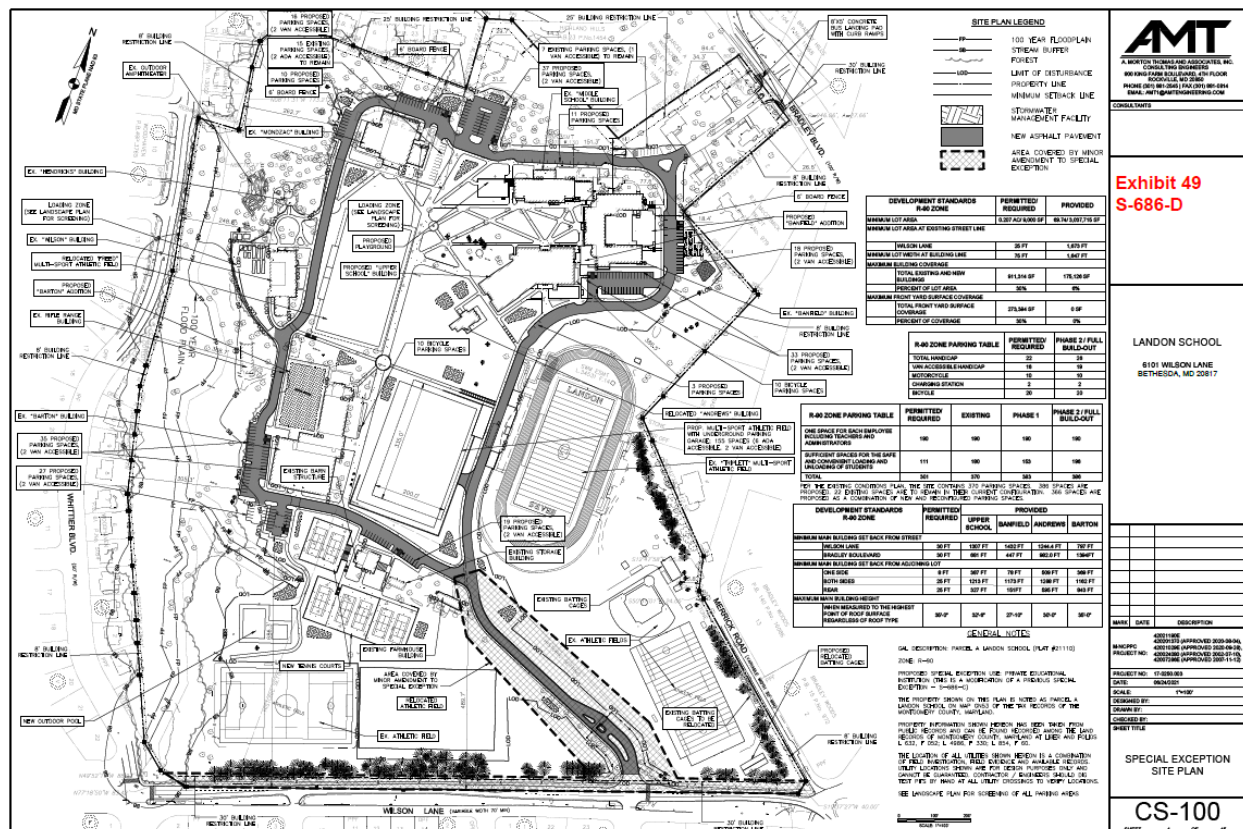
Proposed Phasing of the Landon School Campus Master Plan (site plan)
